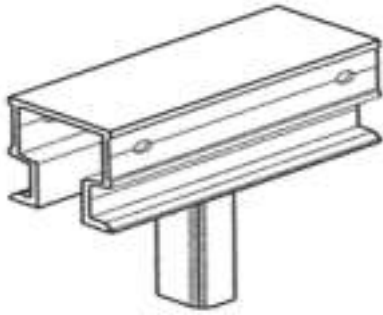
PROP HEAD FOR SOFFIT BEAM.
